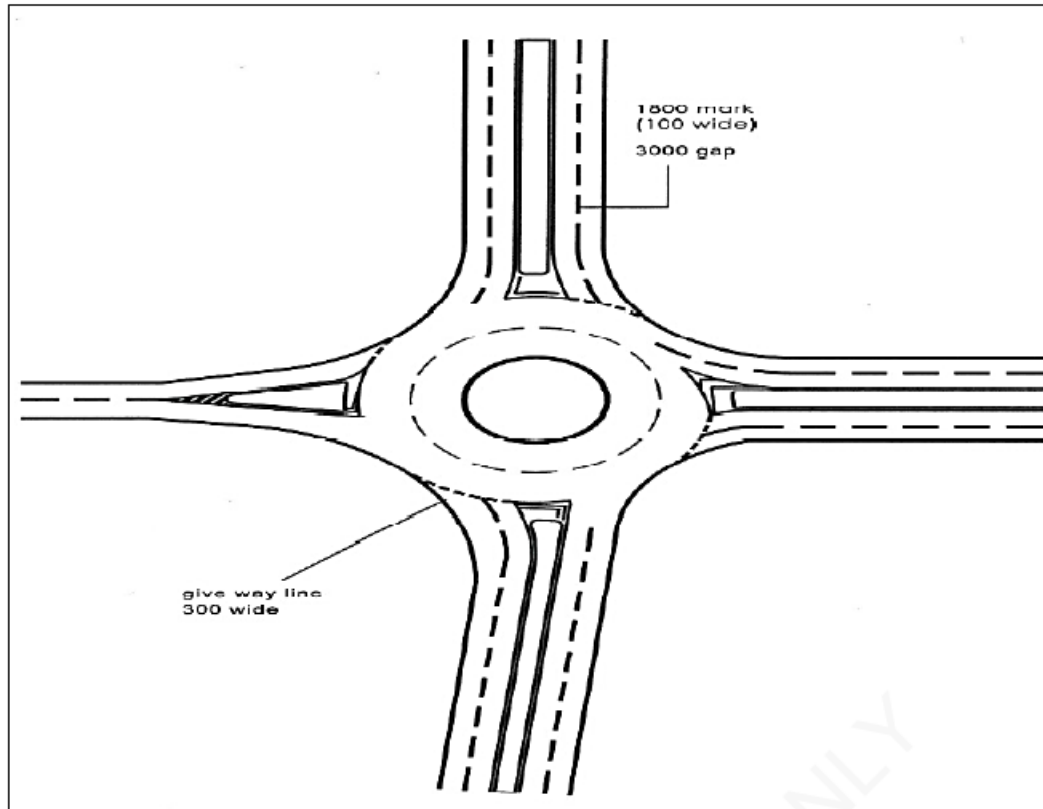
PAVEMENT MARKINGS AT ROUNDABOUT
